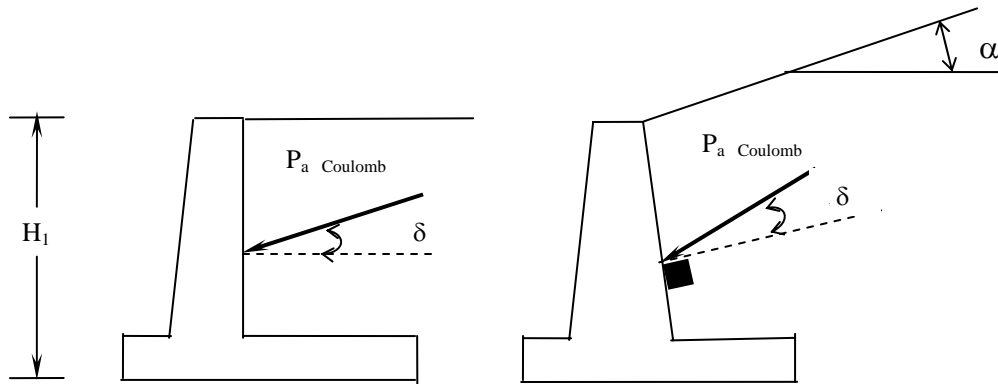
Coulomb Active Force (P_a) and Point of Application. Vertical Wall Face (left), Inclined Wall Face (right)
